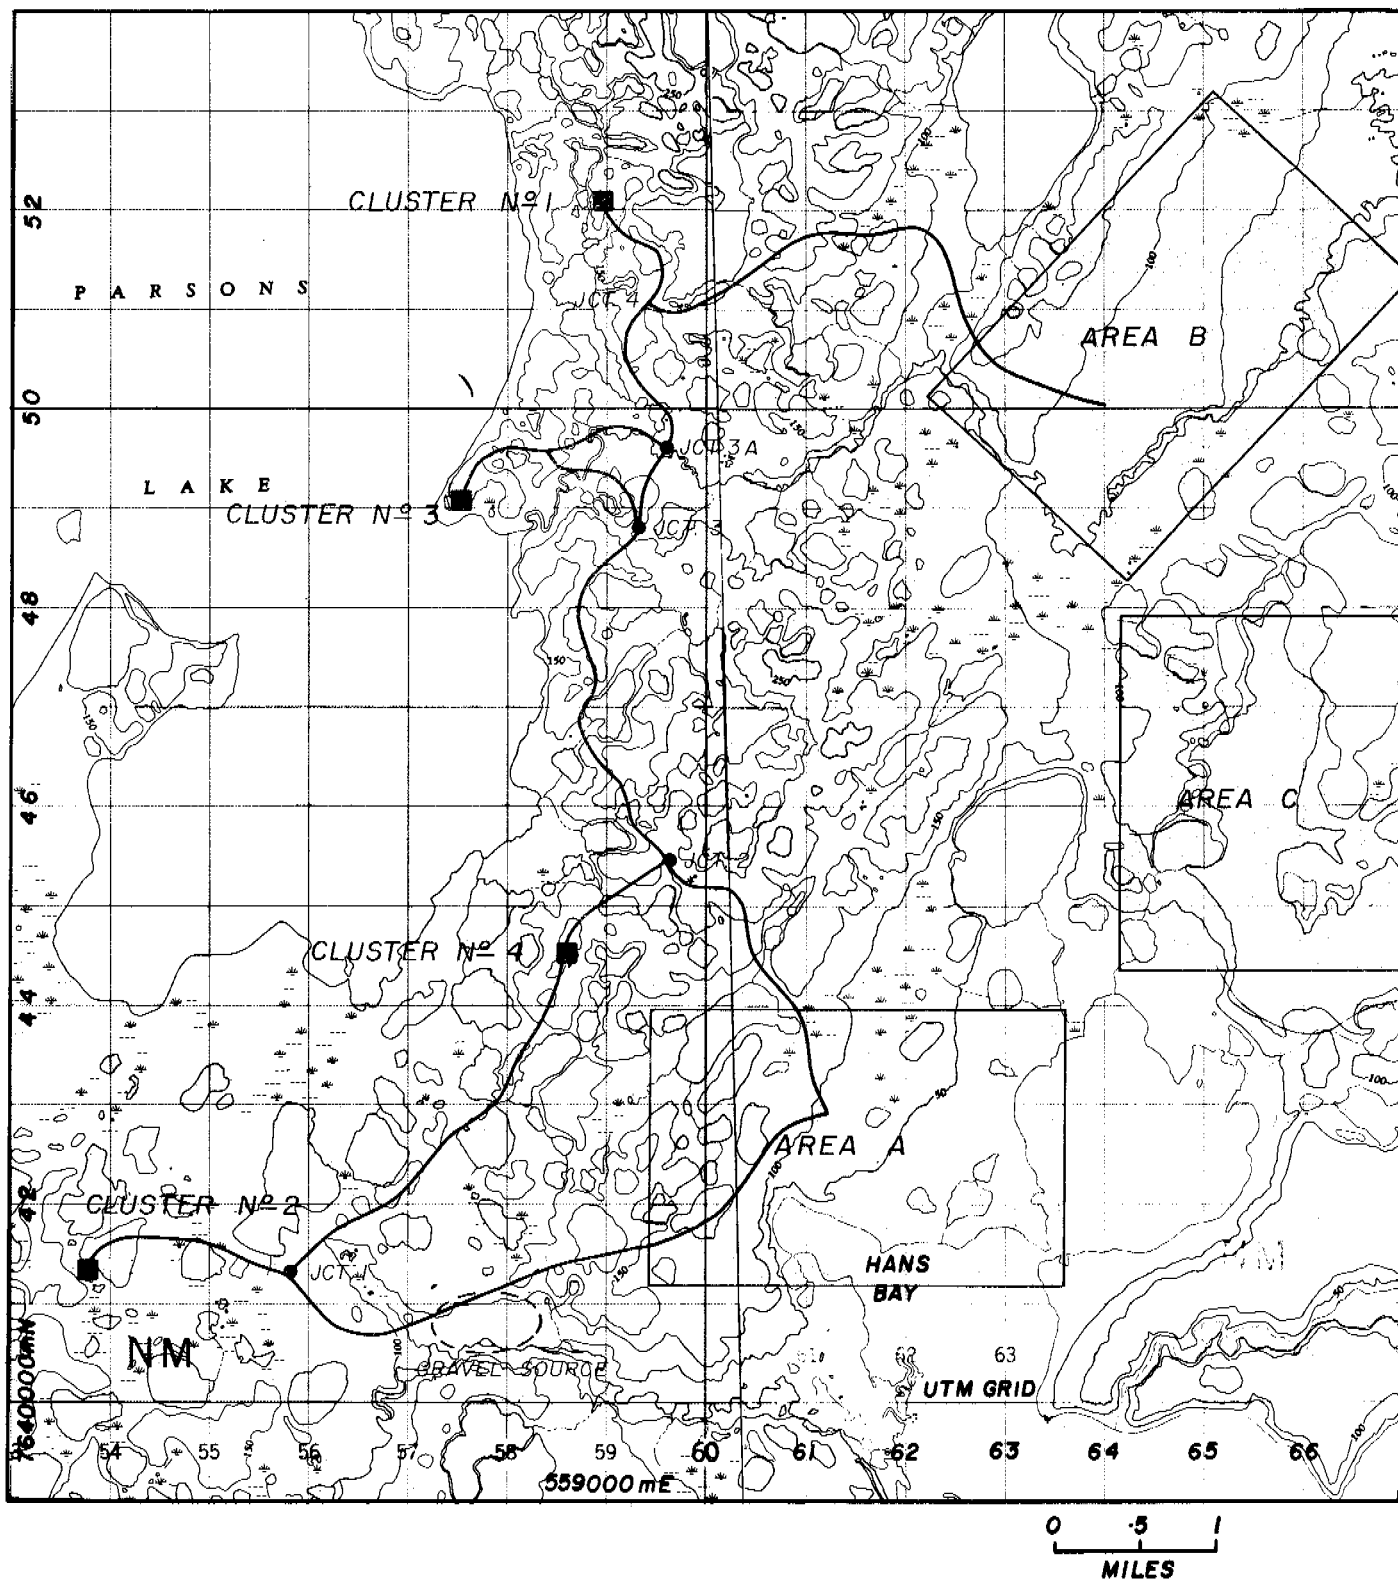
ROADWAY AND PIPELINE CORRIDOR LOCATION PLAN
